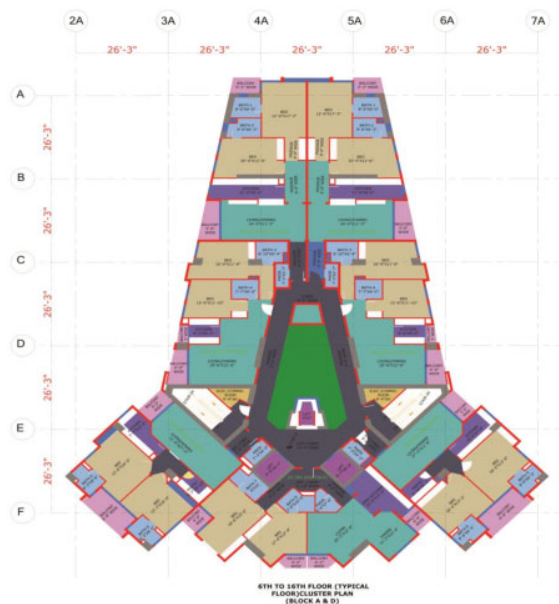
TYPICAL FLOOR PLAN (BLOCK A & D 2 BED ROOM CLUSTER - 01)
